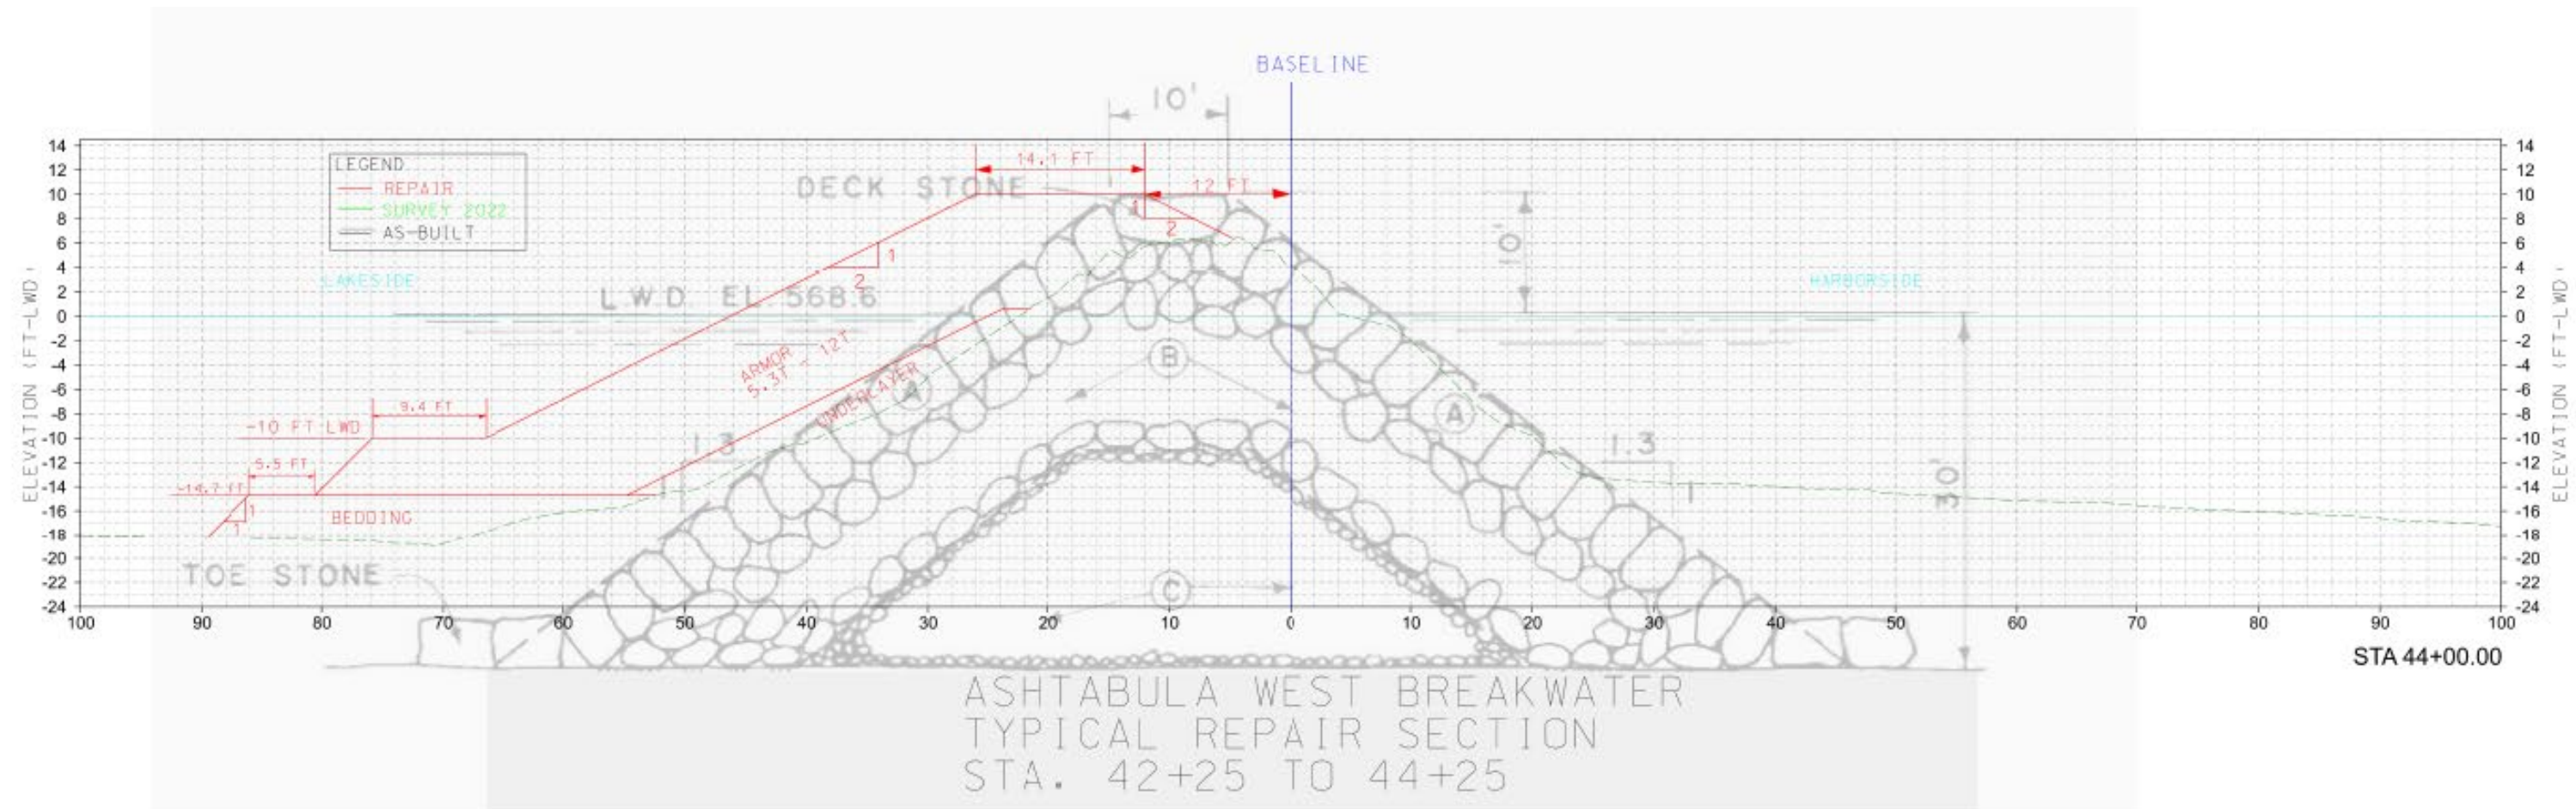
Typical Repair Cross Section, Zone 3 Stations 42+25 to 44+25
